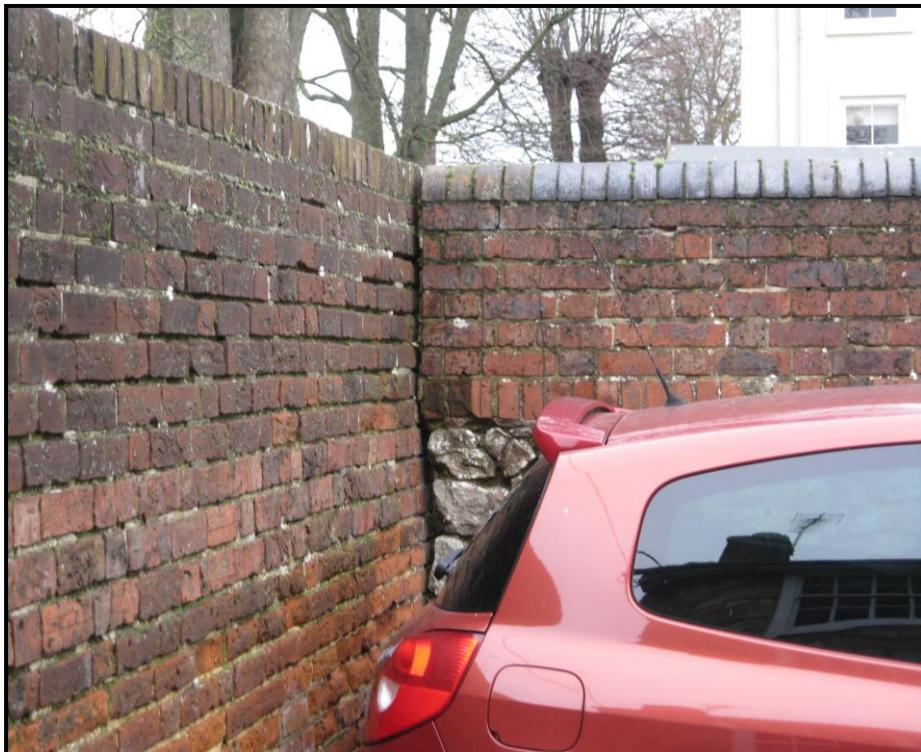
This photo shows the junction between the rag stone wall to 13 Barrow Hill Terrace and the brick boundary wall to the adjacent alleyway adjacent to the school. It demonstrates that the rag stone wall was built after the alley wall, as there is no direct toothing in, but the stone wall has been carefully built to follow the contours of the wall.
